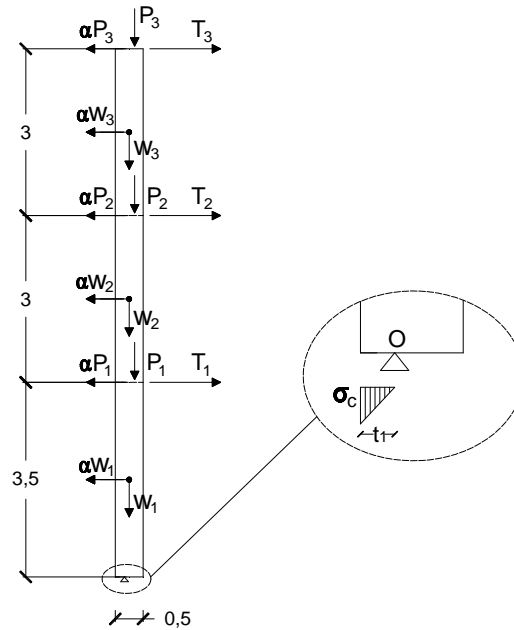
Kinematic mechanism concerning the out-of-plane overturn of the façade wall with the consideration of the wall-to-floor strengthening system.
